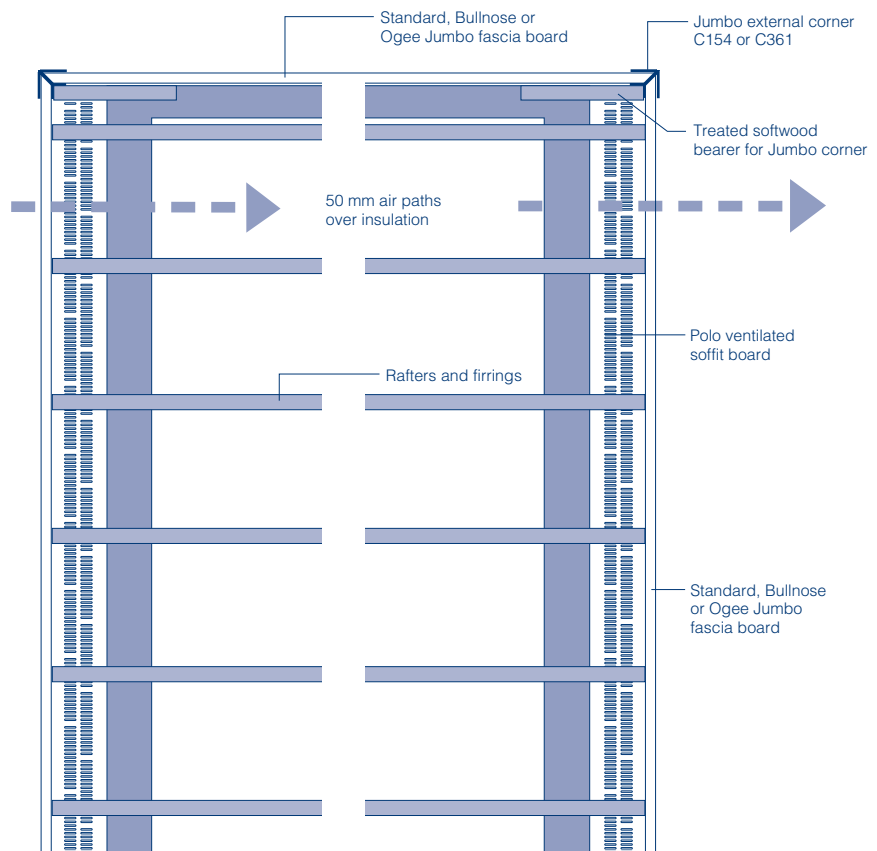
Typical flat roof plan showing ventilation arrangement and Jumbo fascia details
